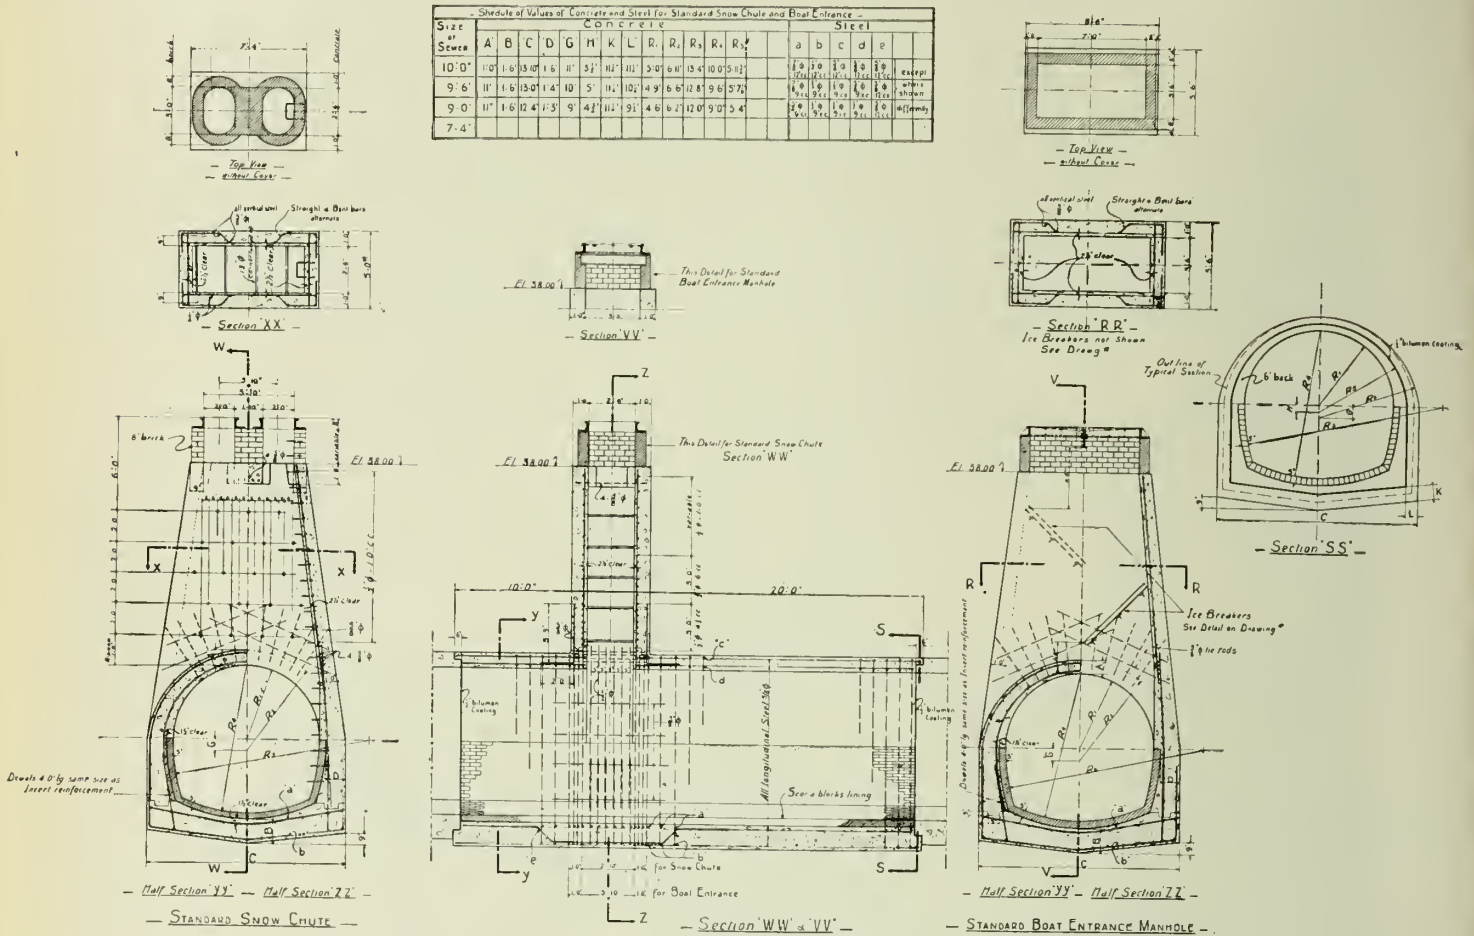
Detail Plan for Snow-chute and Boat Entrance.
